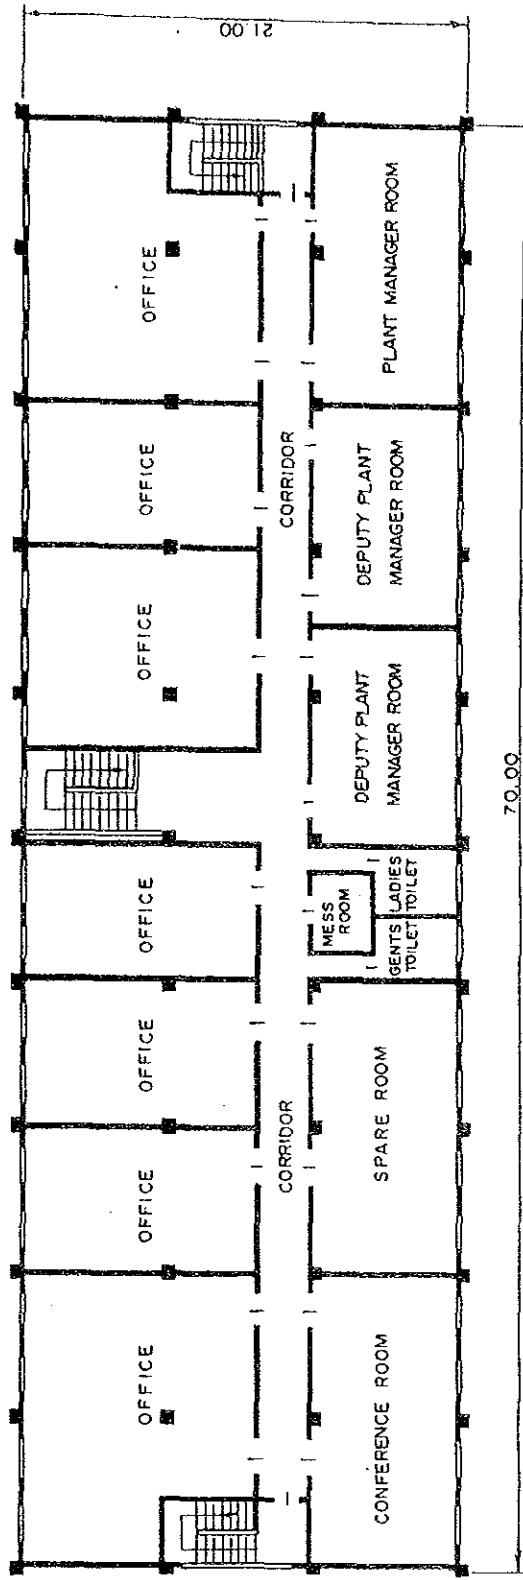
POWER HOUSE (2nd FLOOR PLAN)
